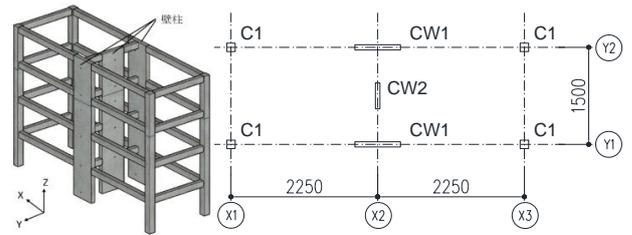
Isometric view of the test structure (slabs not shown) (left); plan view of the structure (right).
